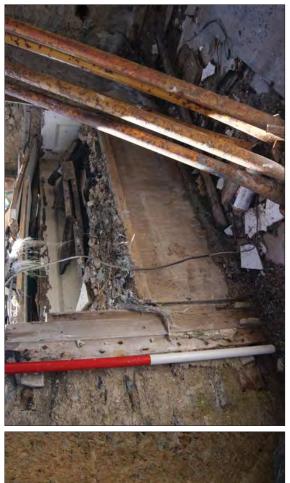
Surviving Wooden Panel at Base of Kitchen Window
